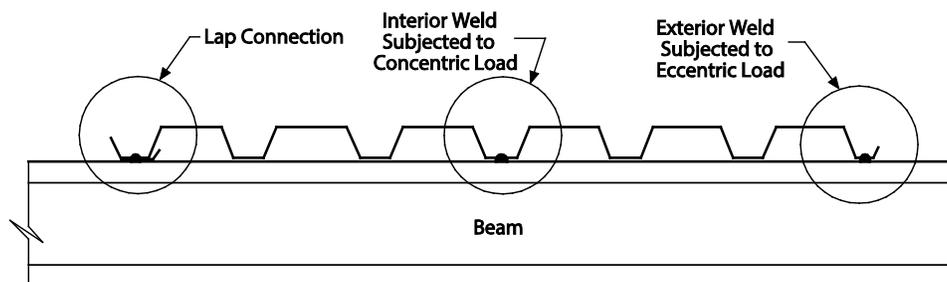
Interior Weld, Exterior Weld and Lap Connection
